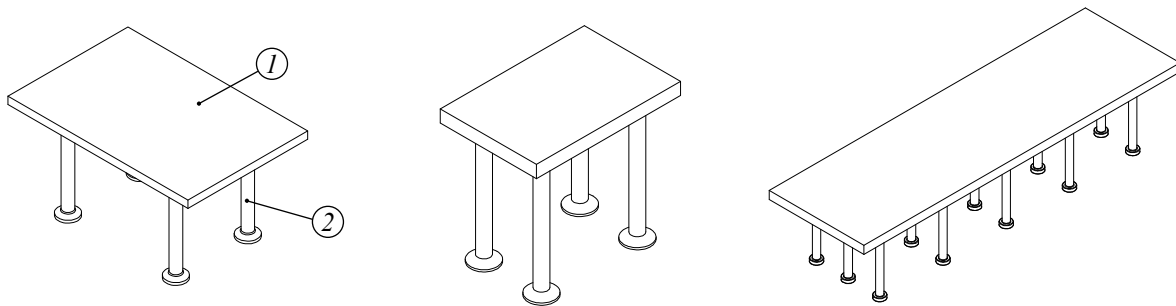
WELDA® Anchor Plate consists of a steel plate and welded headed studs.
